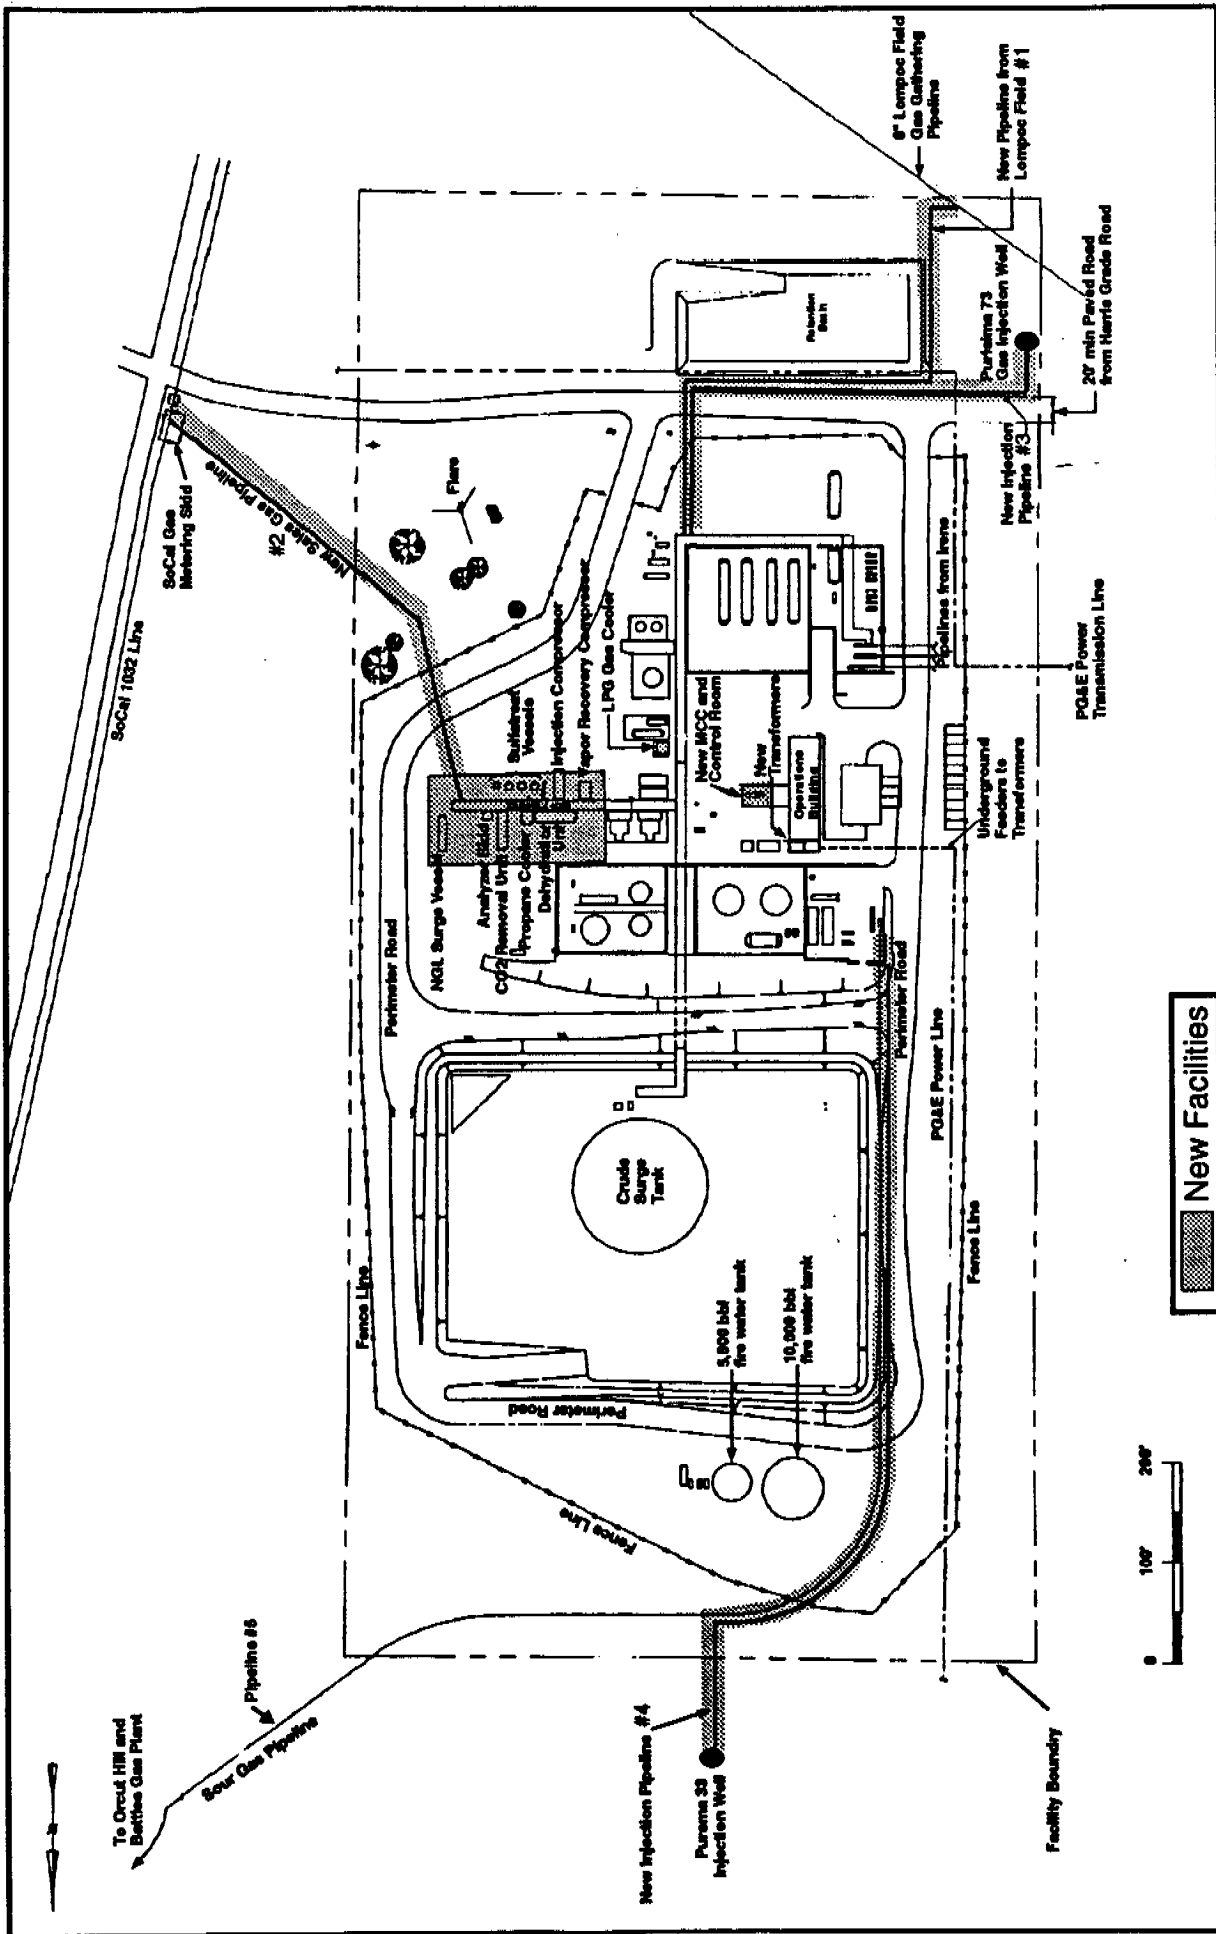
Plot Plan For Existing and Proposed HS&P Facilities
